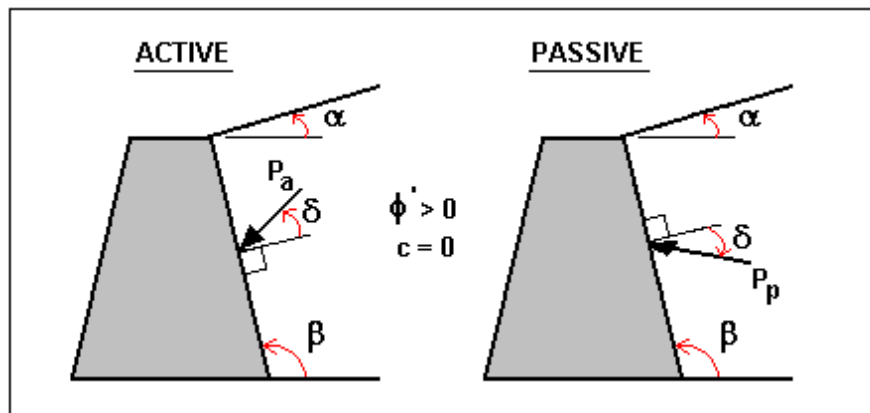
Earth stress against the face of a rough surface gravity wall from a soil body with an inclined ground surface.
